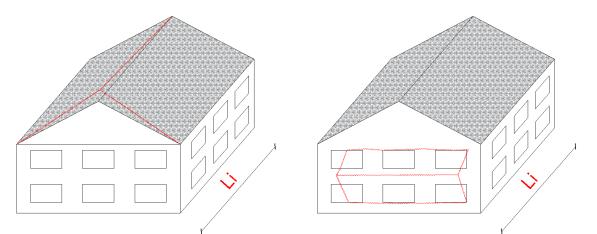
Gable wall overturning failure mechanisms and the Vertical instability failure mechanisms of the wall.
